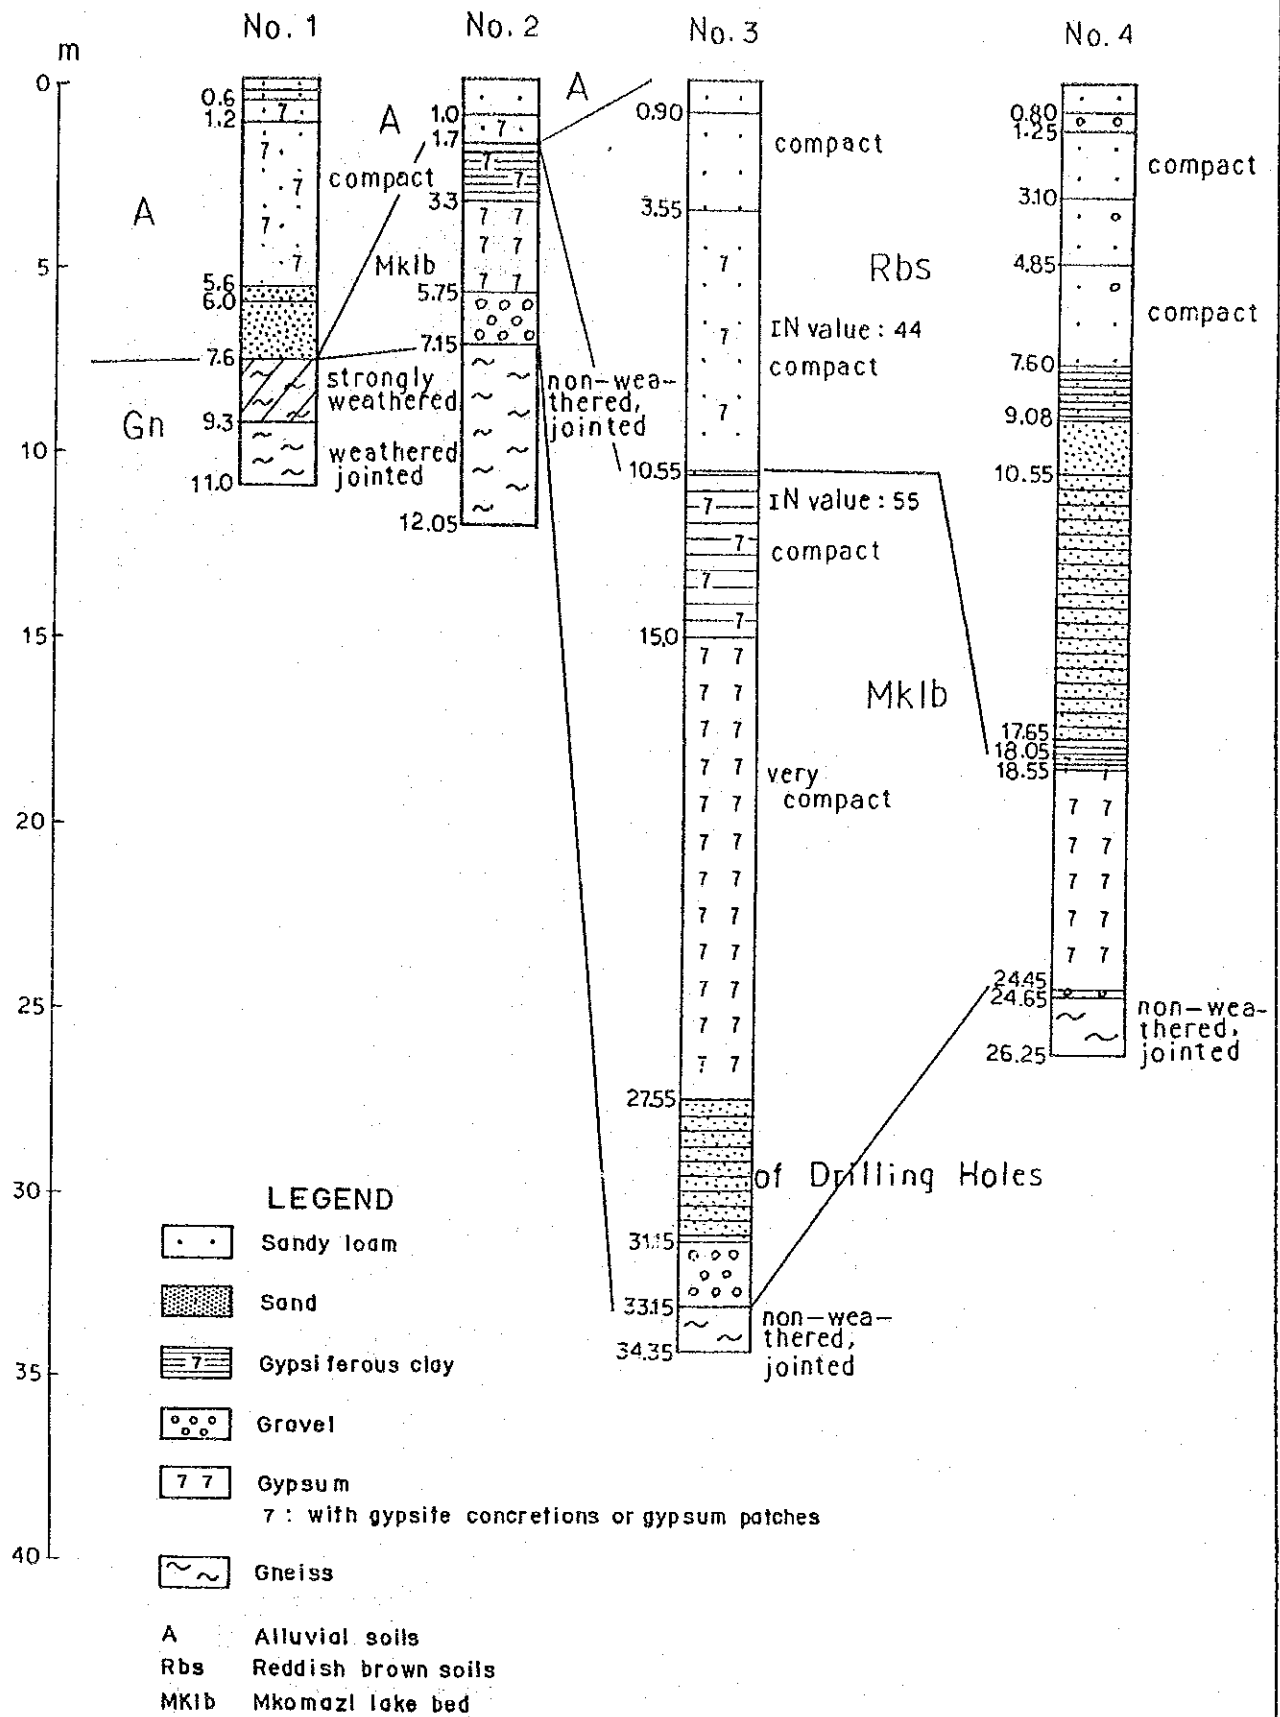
GEOLOGIC COLUMNAR SECTIONS OF DRILLING HOLES IN PROPOSED IGOMA DAM SITE
